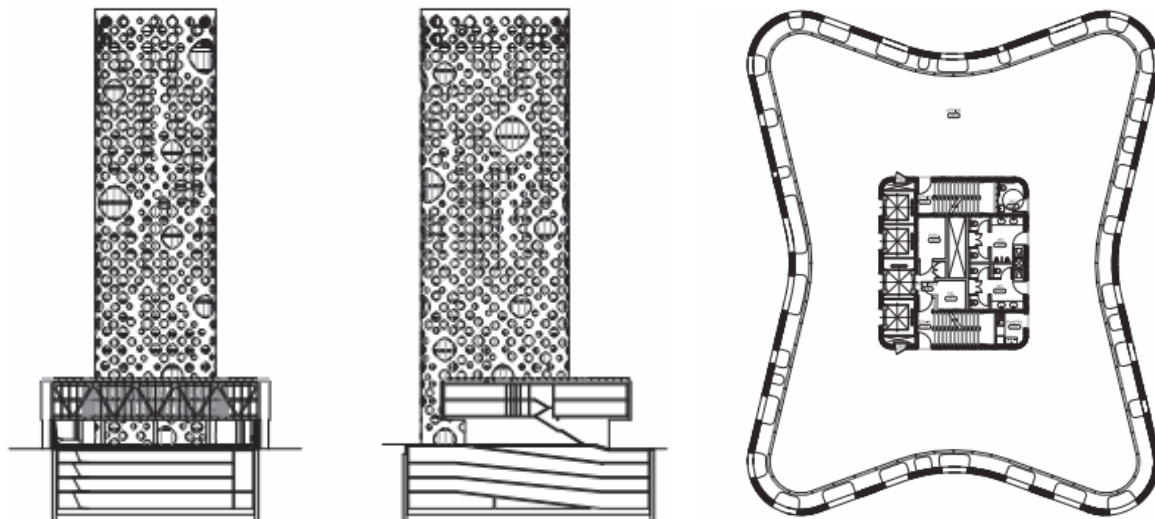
O-14 Tower in Dubai, elevation view and typical floor plan
